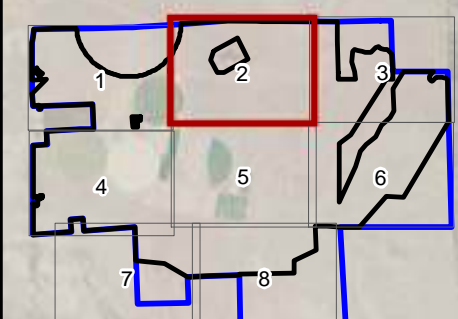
Preliminary Site Plan Sheet 2 of 8
